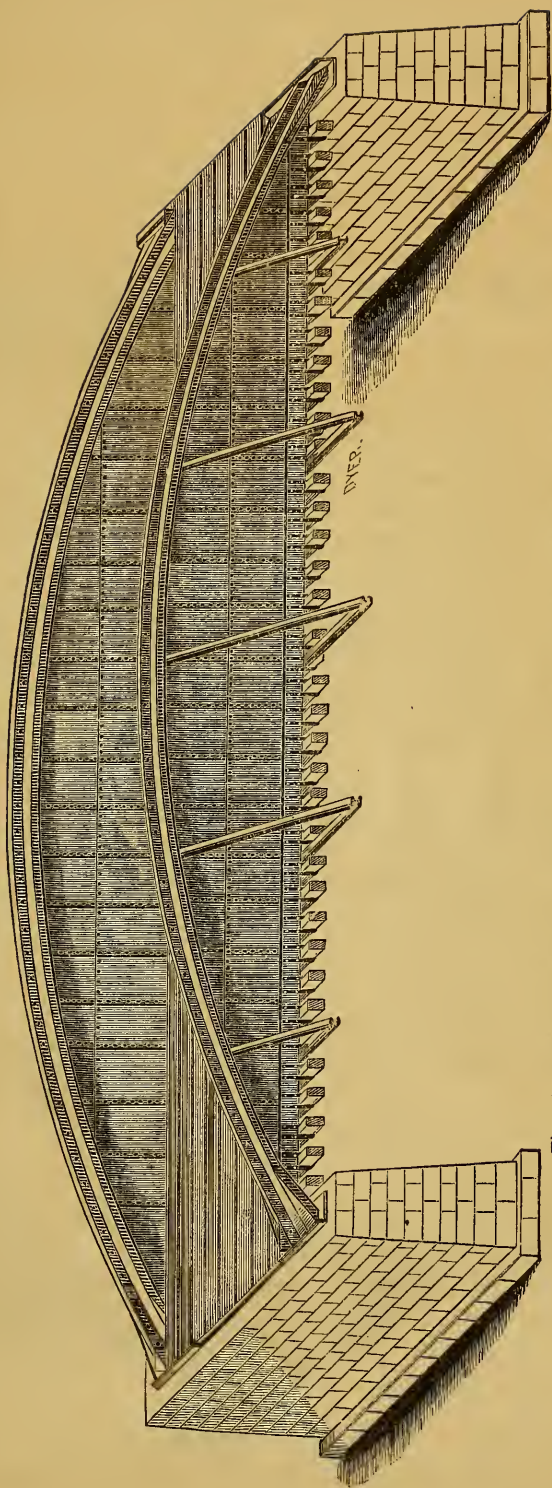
MOSELEY'S WROUGHT-IRON ARCH GIRDER BRIDGE.
